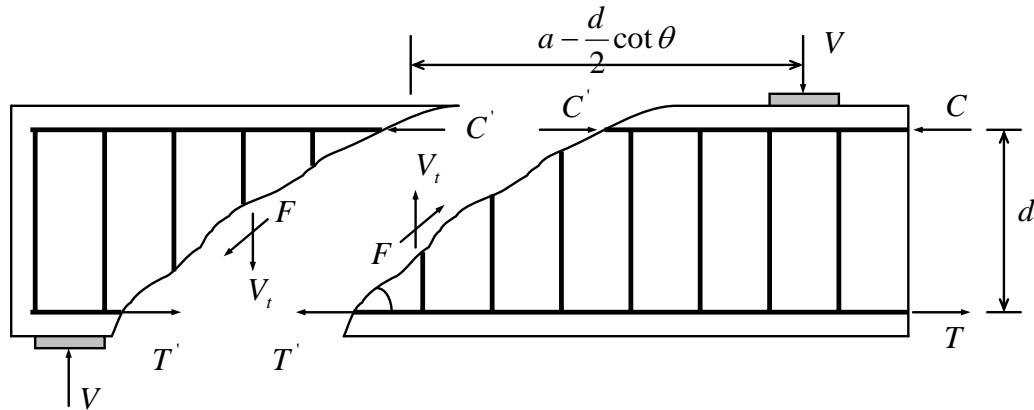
Free body diagram of cracked reinforced concrete beam [H2]
